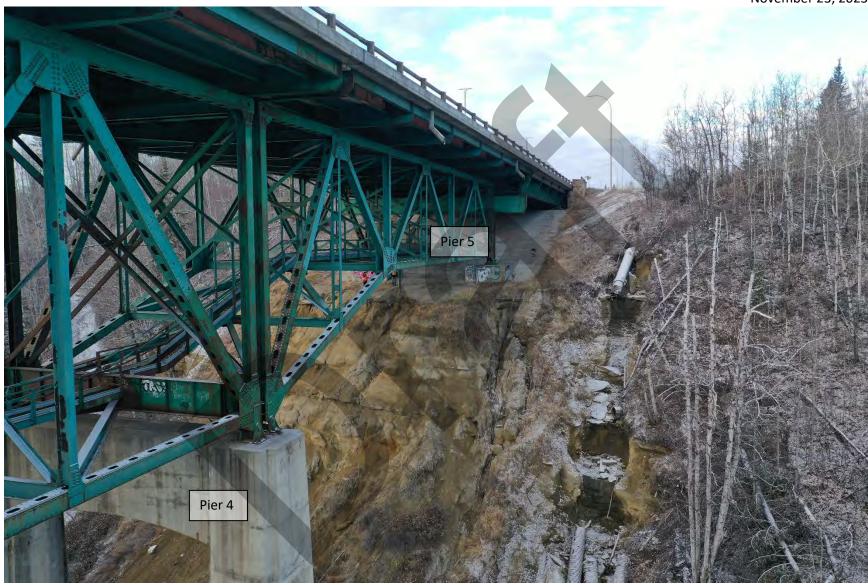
Erosion at west abutment slope, facing west, showing broken sections of culvert and erosion gullies
